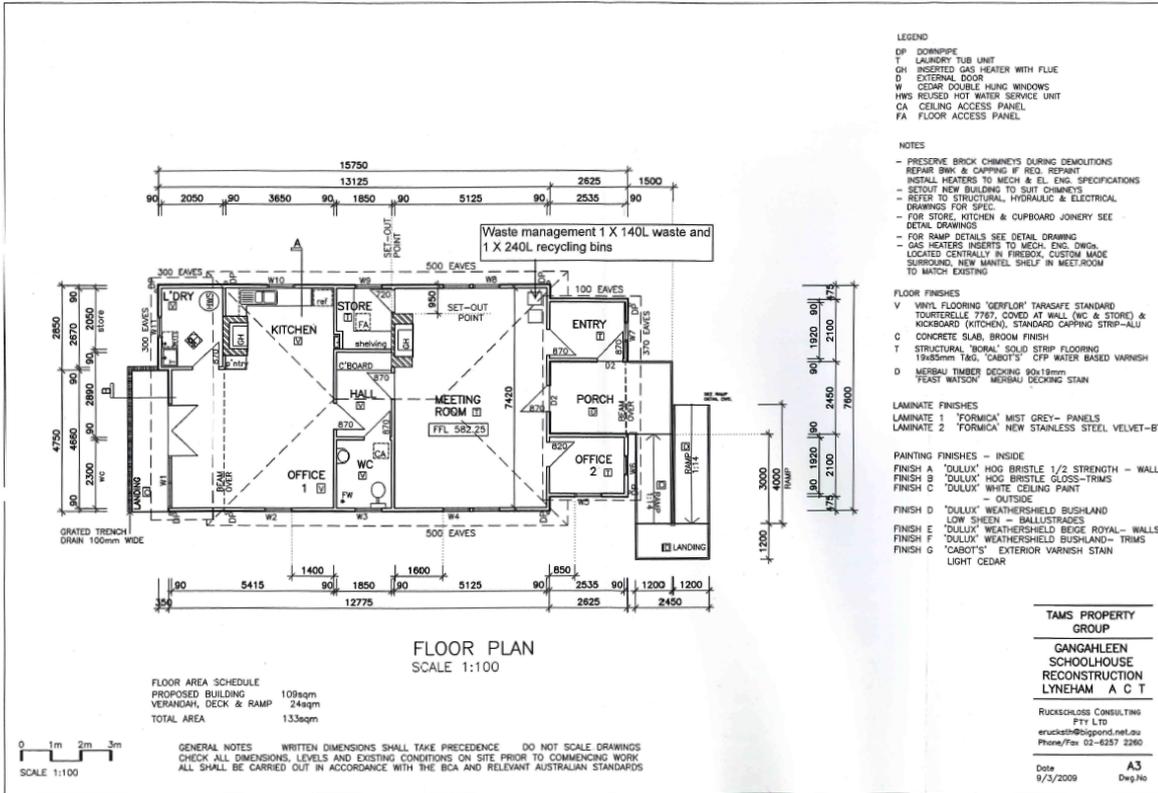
Gungahleen School new building/recreation floor plan (Ruckschloss Consulting , 2009)
